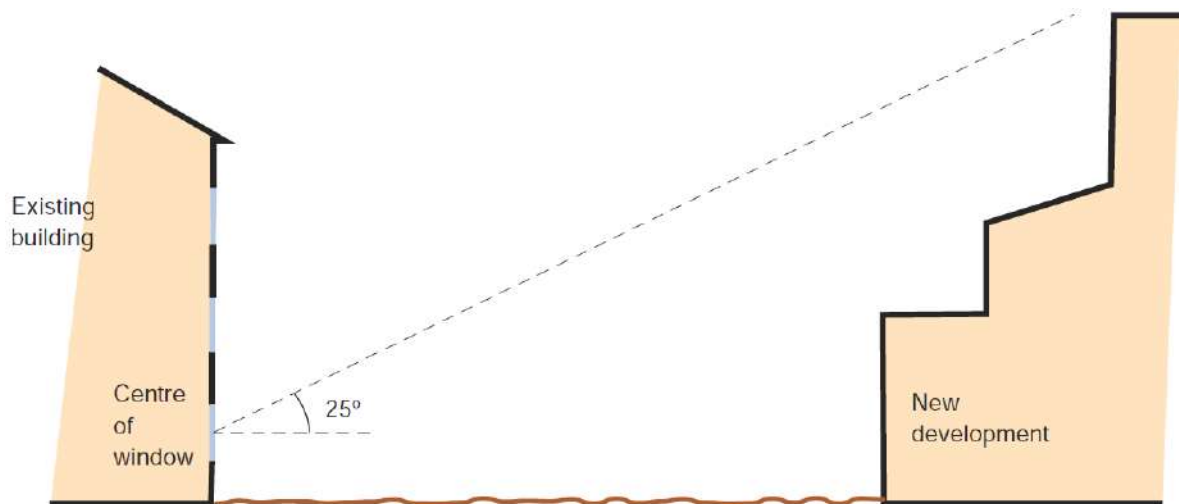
Section perpendicular to a main window wall of an existing building showing a new development subtending an angle of less than 25° to the horizontal from the centre of the lowest window. (© BRE Report 209)
